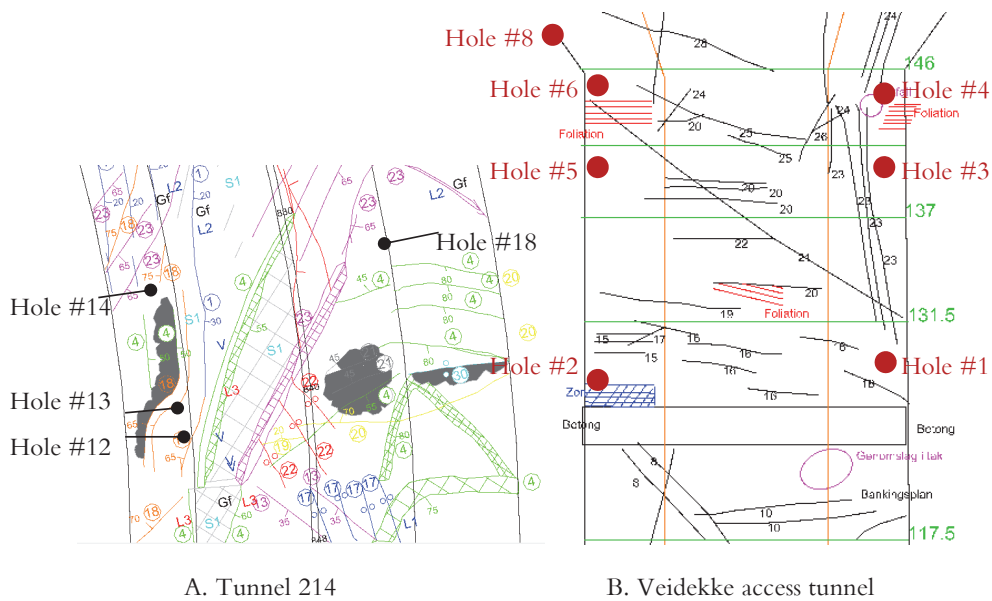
Fracture mapping and diamond core hole locations of Tunnel 214 (A) from the tunnel entrance (section 848) to 21m into the tunnel (section 827) and the drill cores taken in the Veidekke access tunnel (B) from section 117.5, 67.5m into the tunnel to the entrance to gallery at section 146, 96m into the tunnel.
